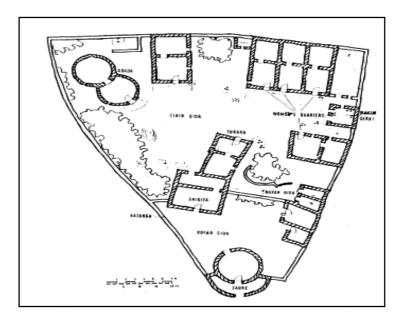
Typical Hausa Traditional Courtyard House Plan. Source: Rowan (1981).
